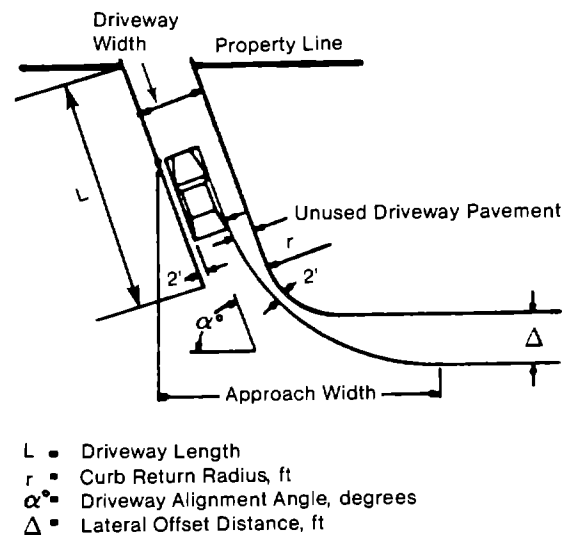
DRIVEWAY DESIGN ELEMENTS
